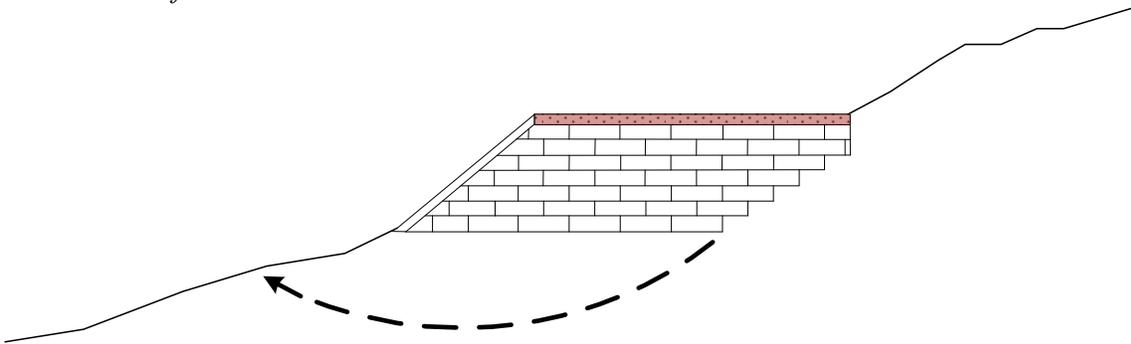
Bearing capacity failure of the embankment due to general shear failure or local shear failure.
